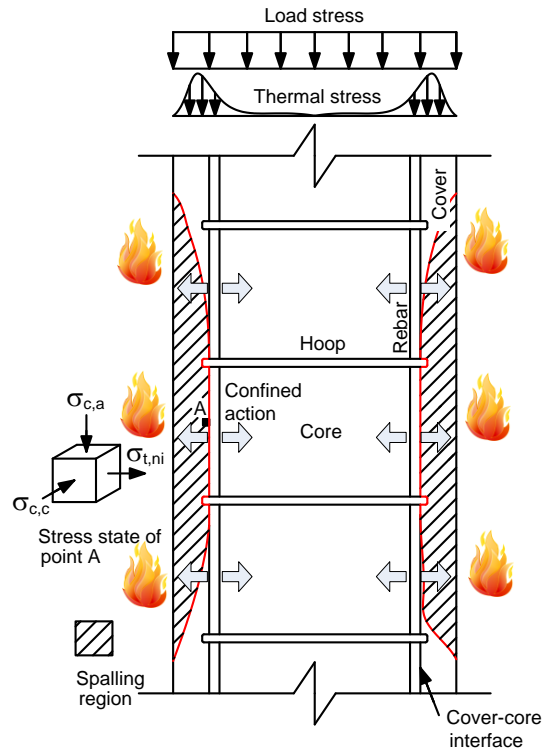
Schematic representation of thermo-mechanical spalling of a concrete member
